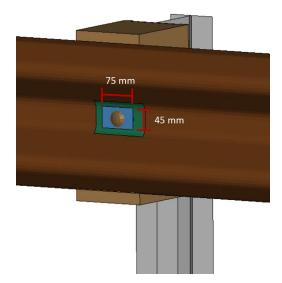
2.2.23 – Mounted Guardrail Washer
